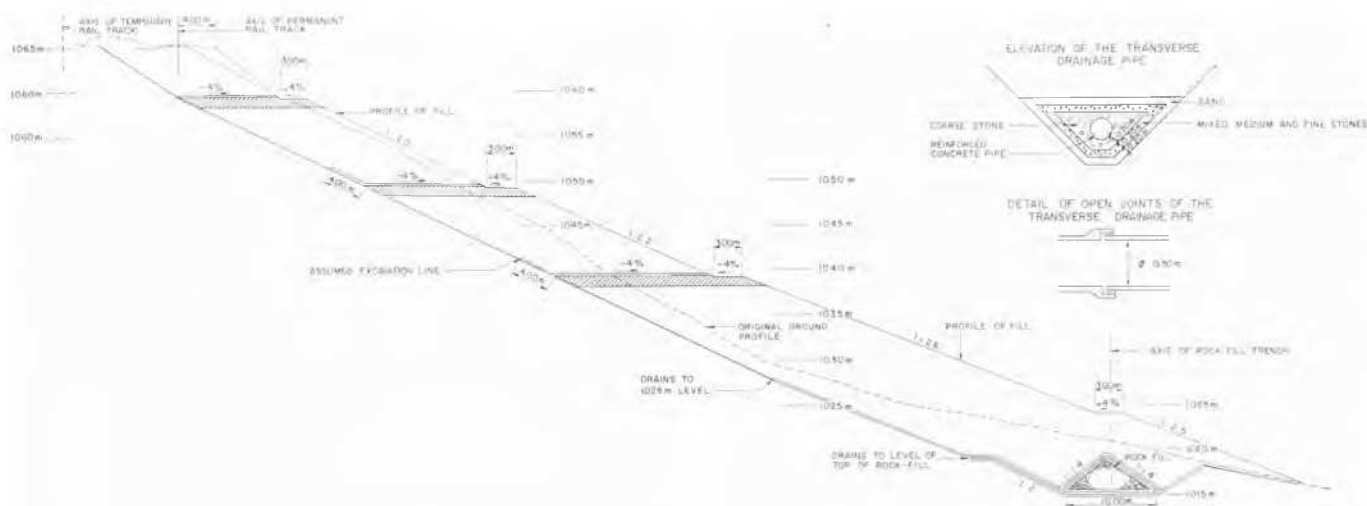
Bichancos's fill (Estrada de Ferro Central do Brasil) showing details of subsurface drainage.
